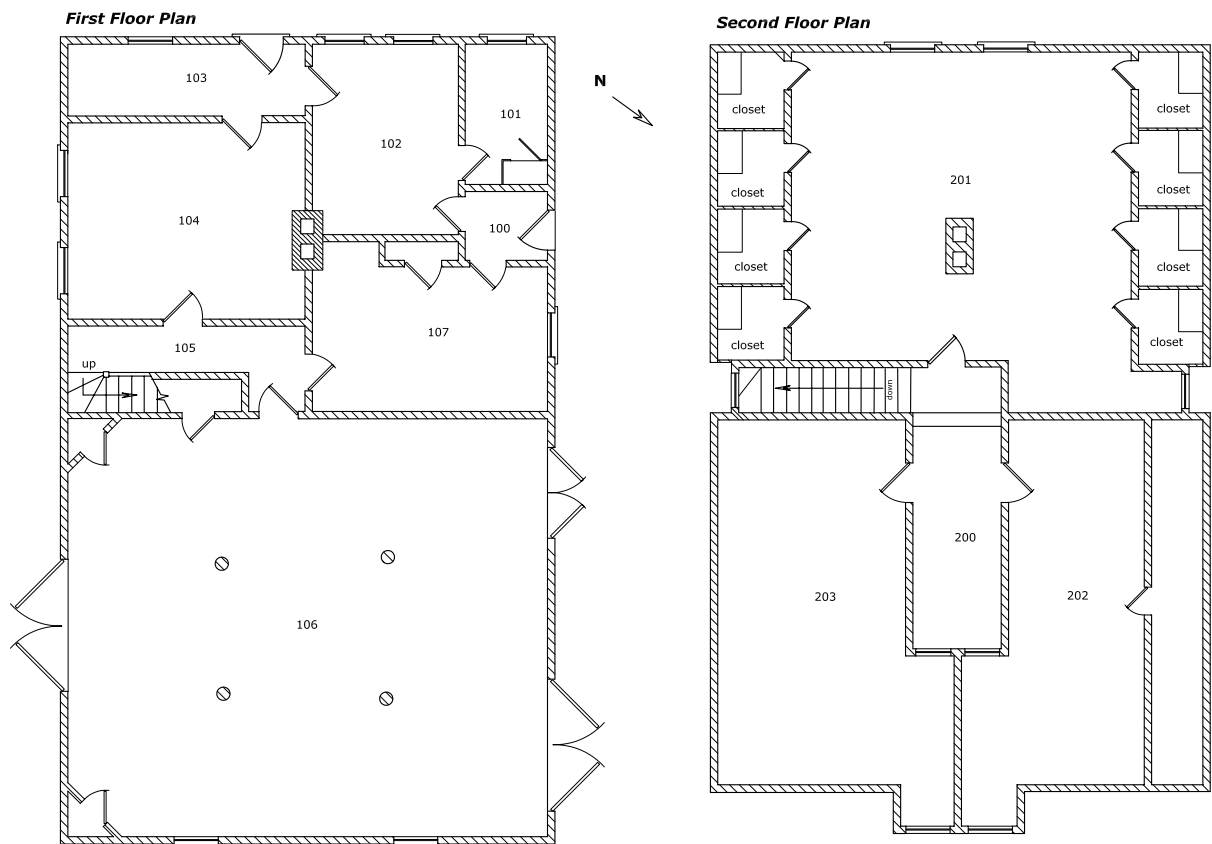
Floor plans of existing building. Scaled drawings may be found at the end of this section.
